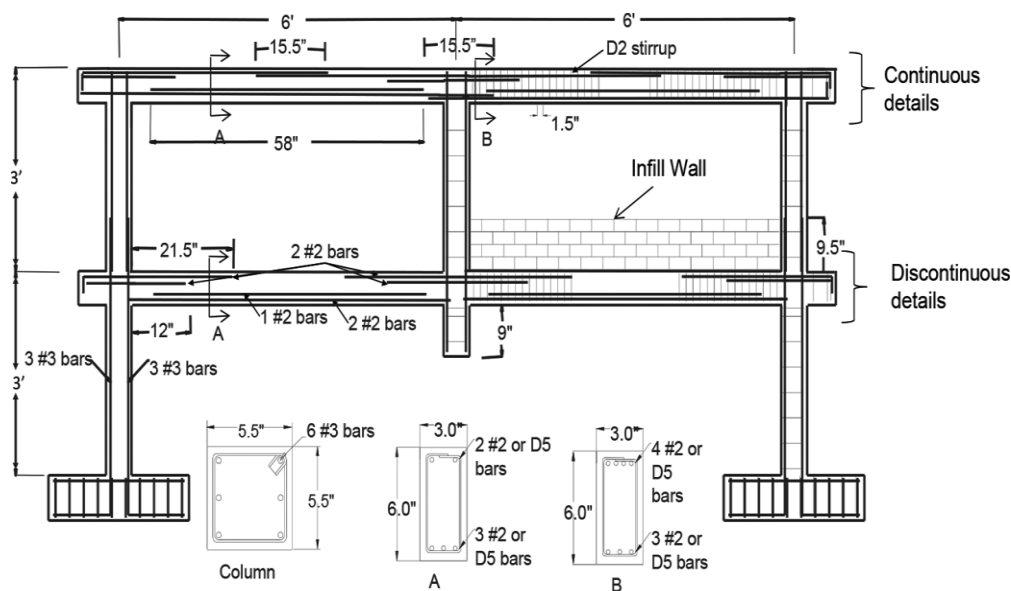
Reinforcement arrangement of tested specimen (Stinger & Orton 2013)
